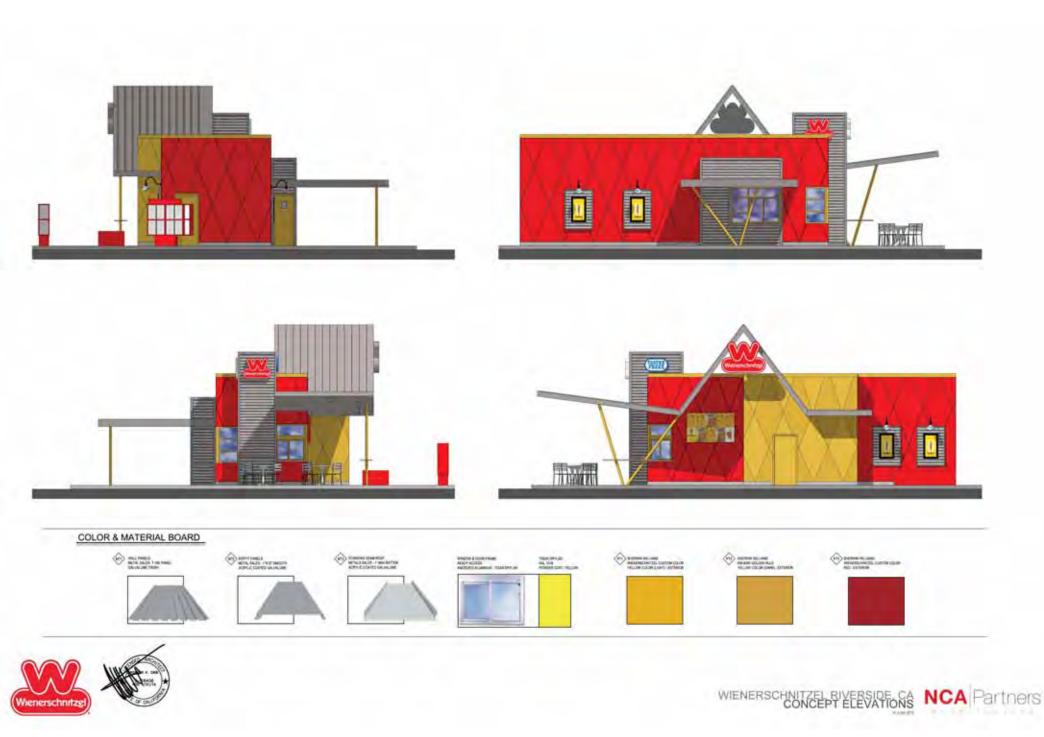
P15-0068, -0175, -0176, -0399, -0400, Color Building Elevations
